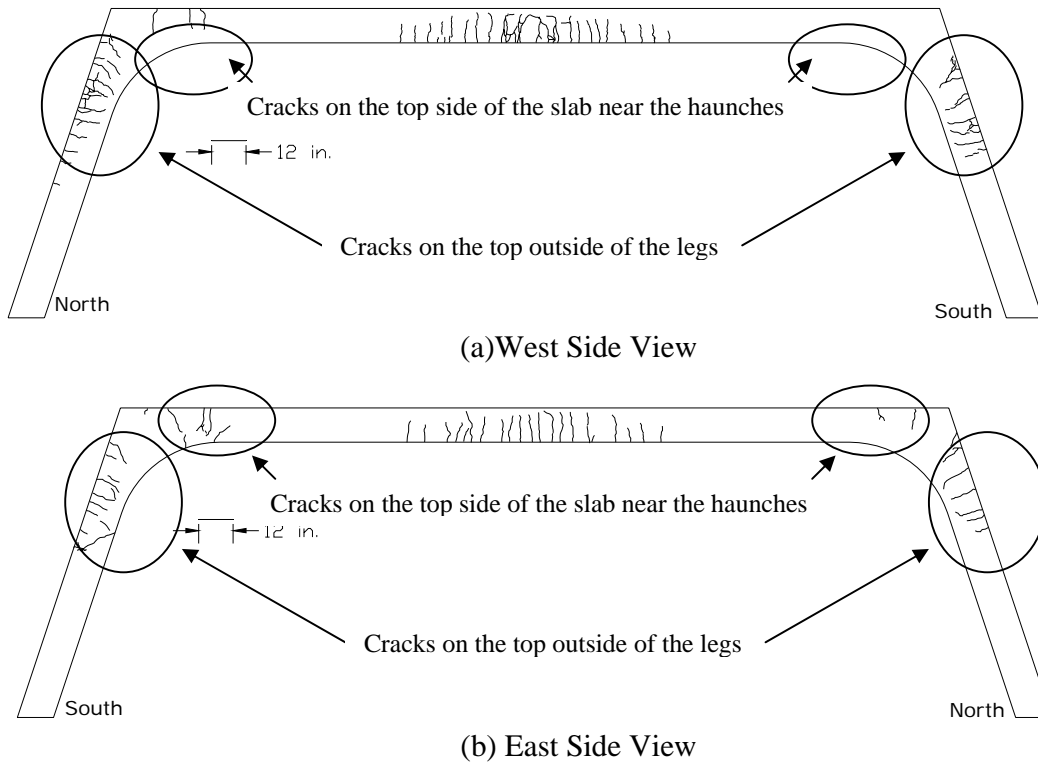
Crack Patterns for the Sides of the Test Specimen
